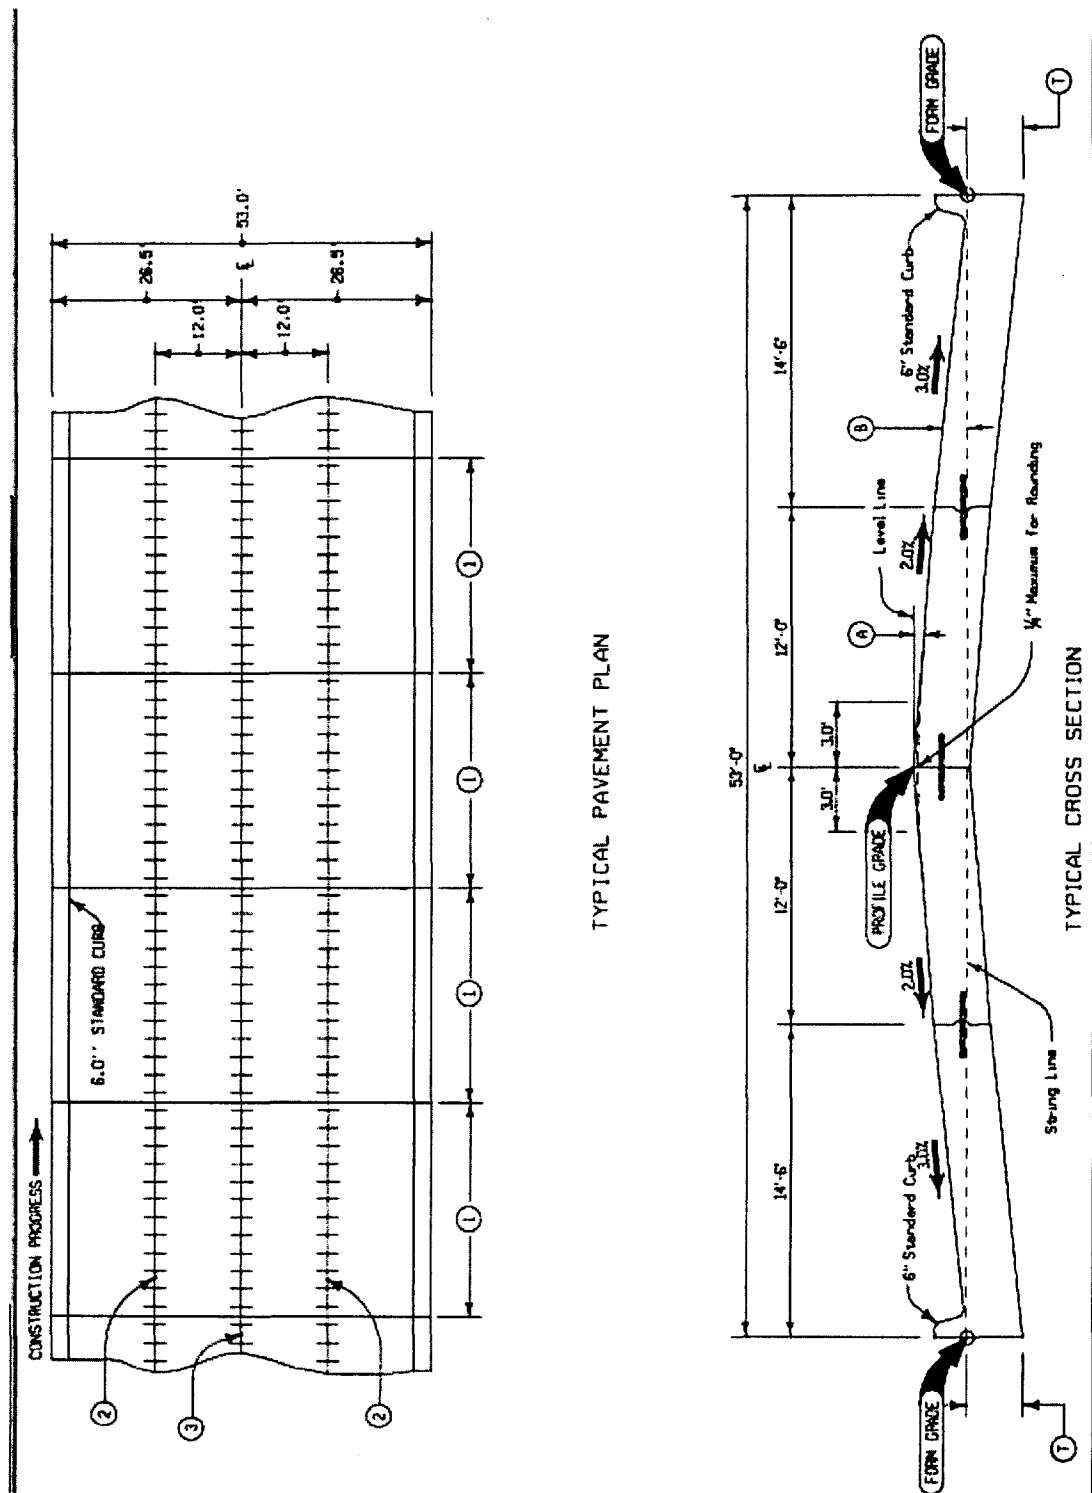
Portion of pavement plan from Iowa DOT standard drawing RH47b
